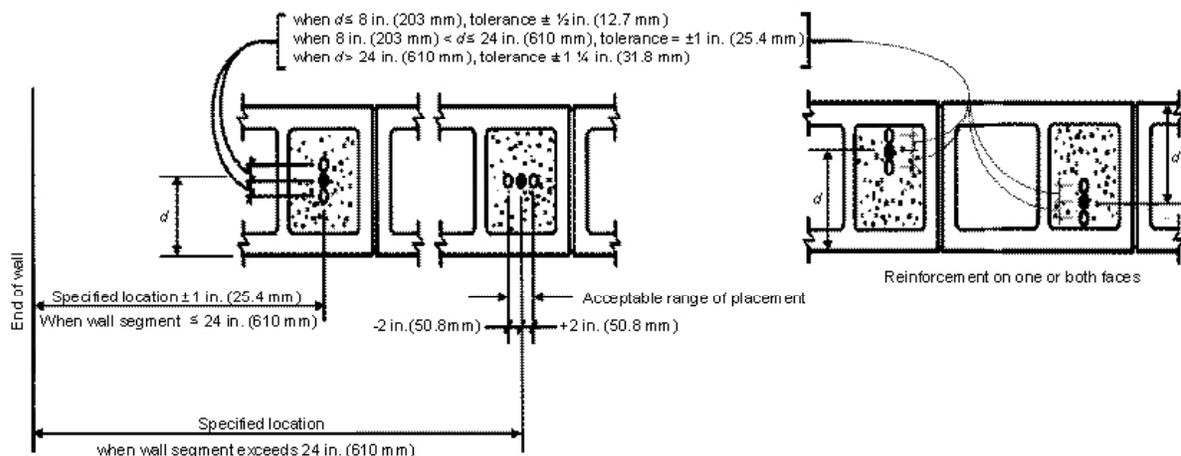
Placement tolerances for reinforcement embedded in masonry construction based on the effective depth,  $d$ .
